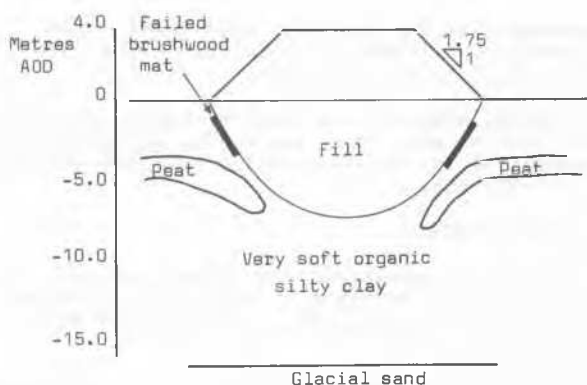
Former Railway Embankment (Bypass chainage 2100)
